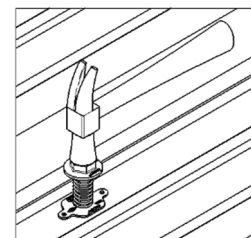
CADDY CRLW CONCRETE INSERT INSTALLATION INSTRUCTIONS (MPII)
